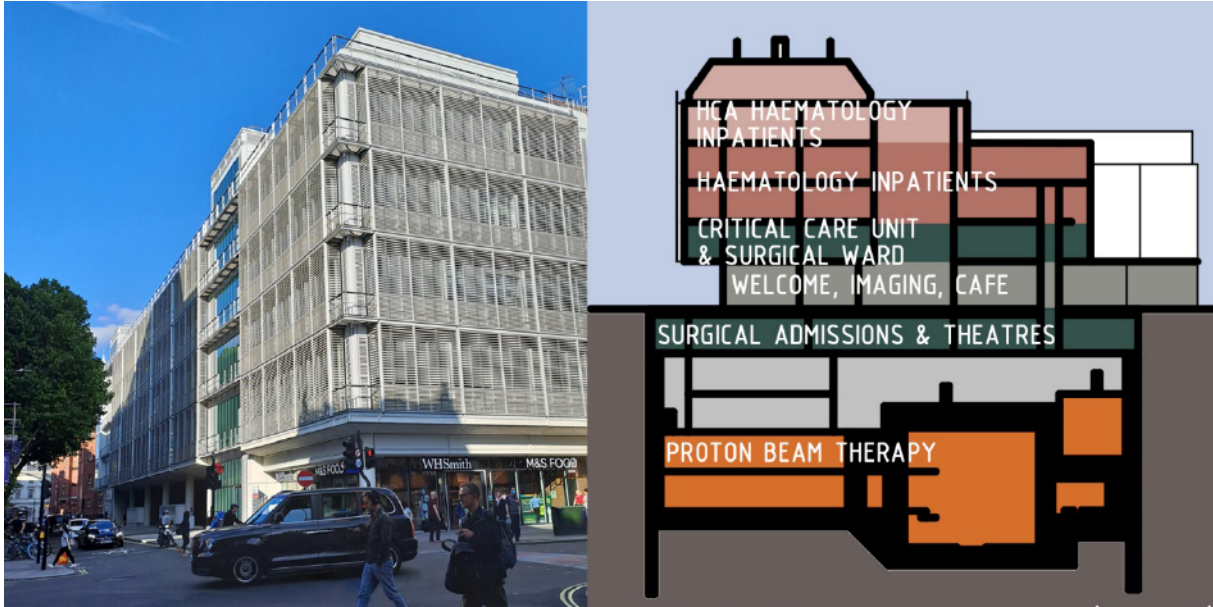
University College Hospital Grafton Way Building, London – view of the building and schematic cross-section through the building. Photo by Rafal Strojny. Drawings elaborated by the authors from online material available at the Edward Williams Architects office. Source: <https://www.edwardwilliamsarchitects.com/projects/view/uclh-phase-4-and-proton-beam-therapy-unit-london-uk>
